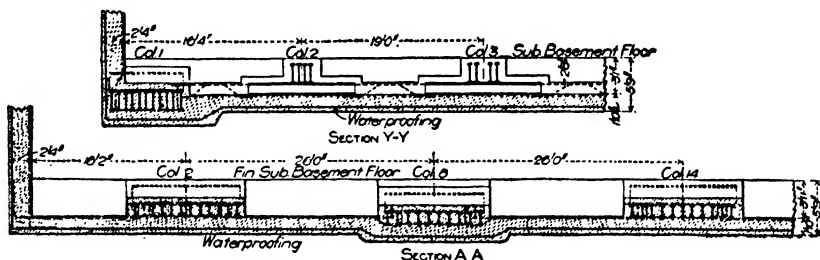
c*.—Cellar-floor Sections Showing Grillage Beams and Reinforced-concrete Girders, Pope Building, Cleveland, Ohio.
